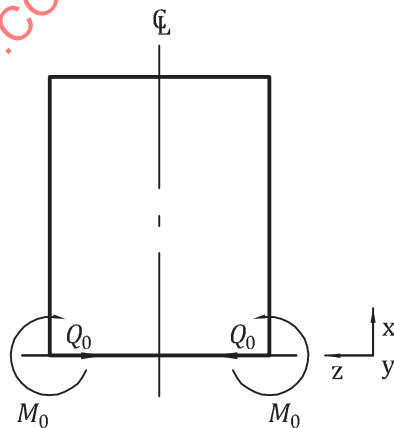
M_0 and Q_0 acting on tank wall bottom
